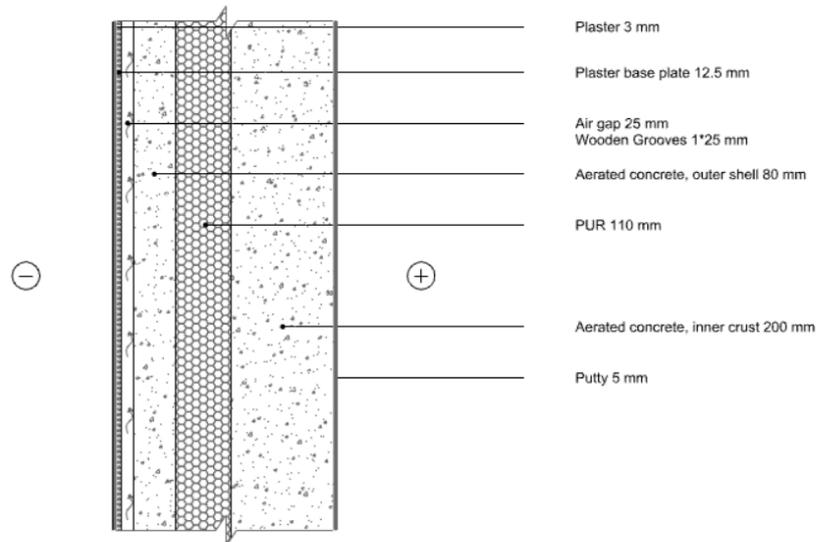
Details of layers of Autoclaved Aerated Concrete Walls (V3)
